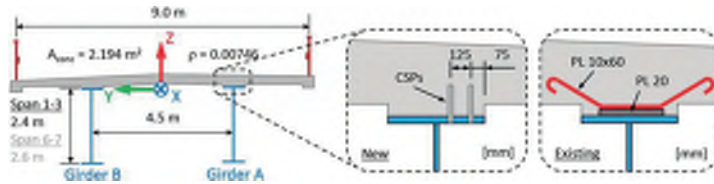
Typical cross section of the superstructure and illustration of the shear connections
